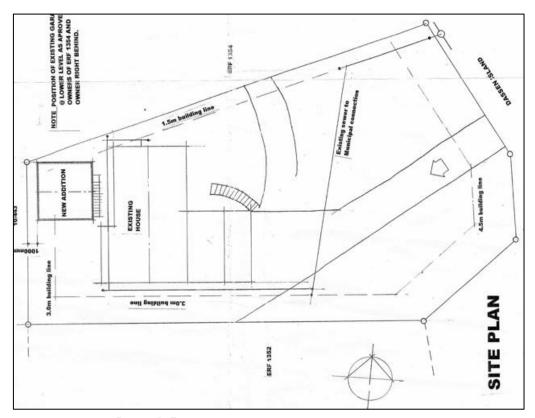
EXTRACT PREVIOUSLY APPROVED BUILDING PLANS
